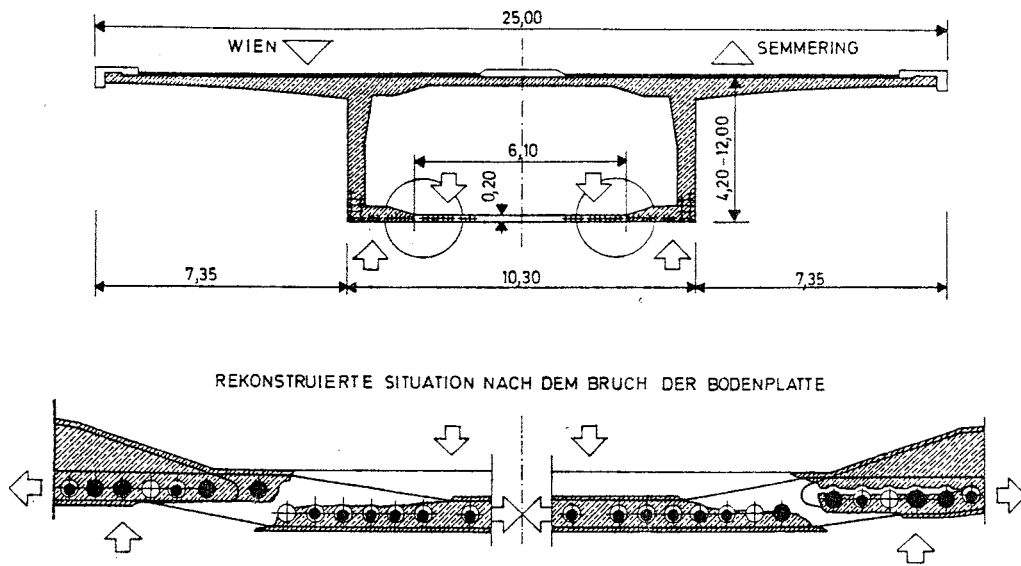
Failure of Bottom Slab at Schottwein (from Ref. 11).
